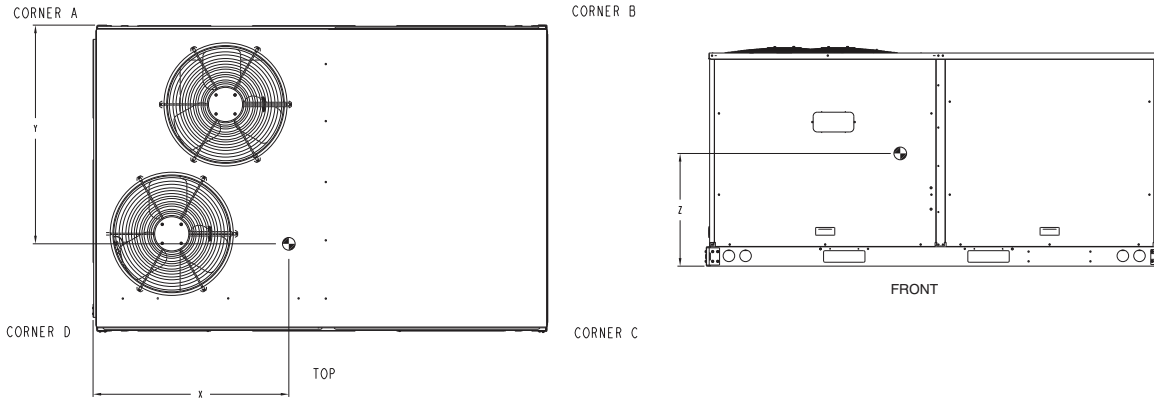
Dimensions RAS 090-121 (Sheet 2 of 2)
